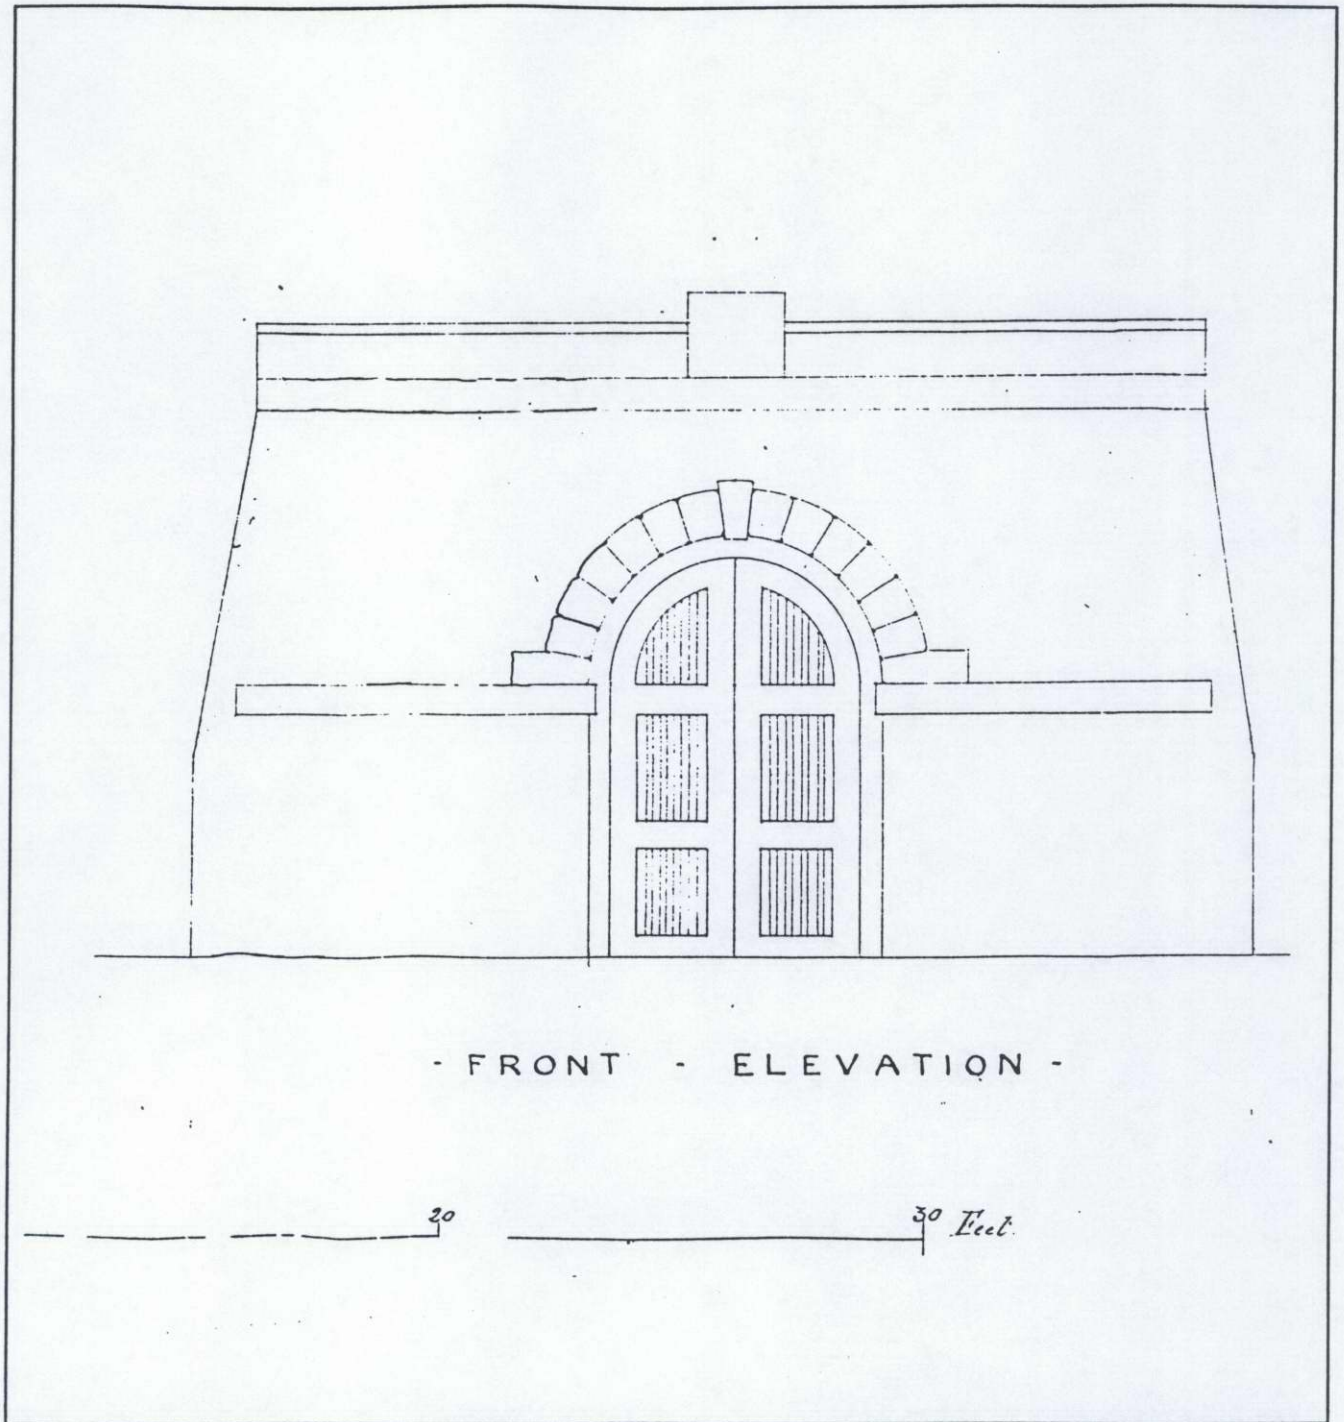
Elevation of Pikeing Well by Thomas Pickersgill 1858
